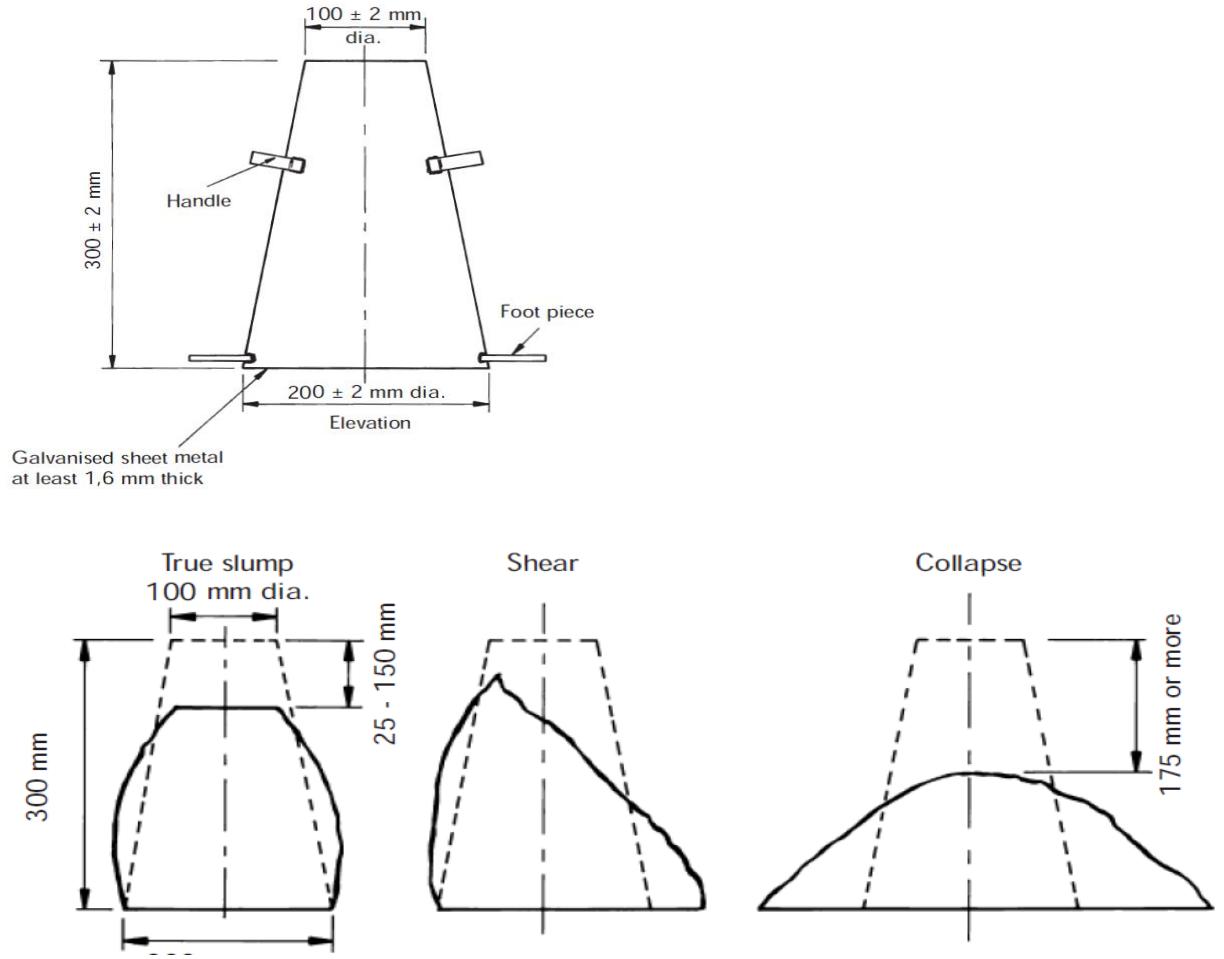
(Top) Slump cone, (bottom) measuring slump (Addis & Owens, 2001)
